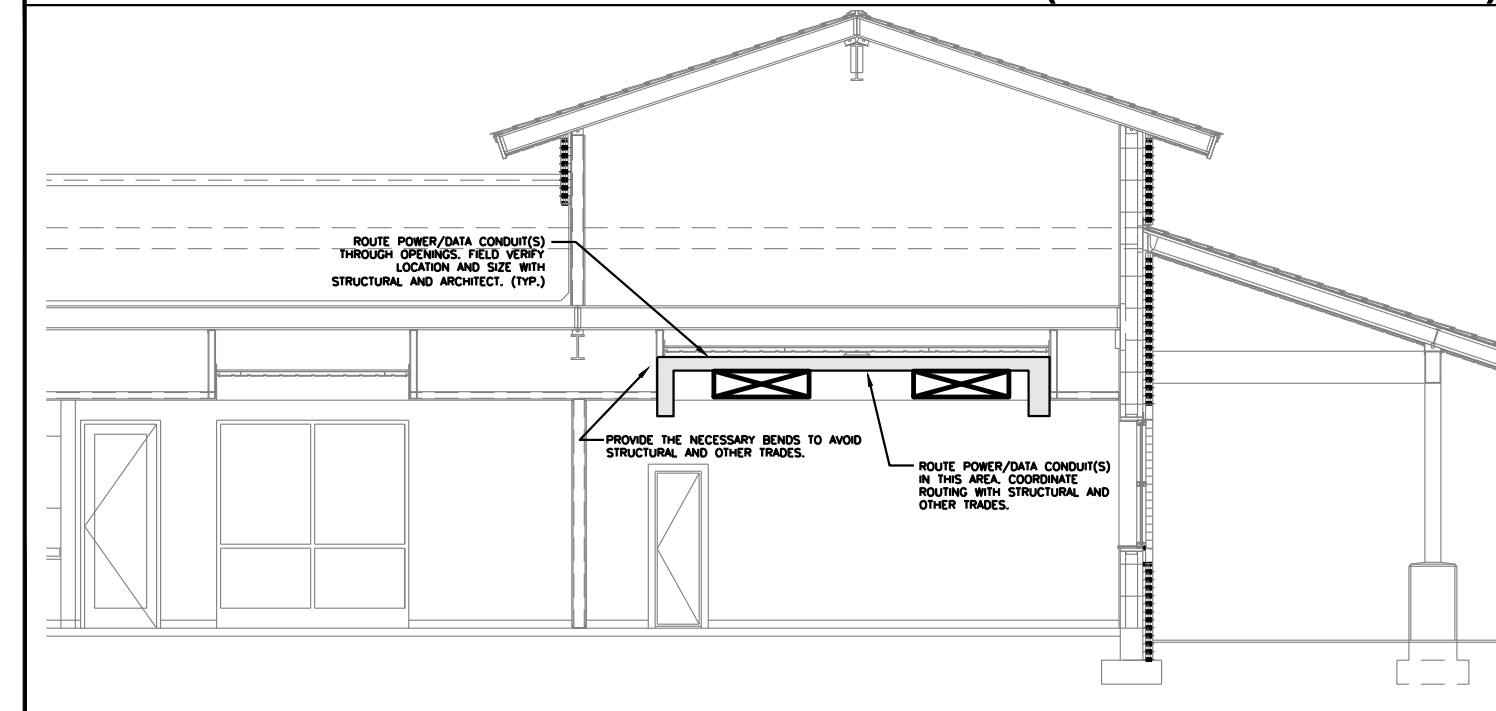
ELEVATION DAY ROOM (LOOKING WEST)
